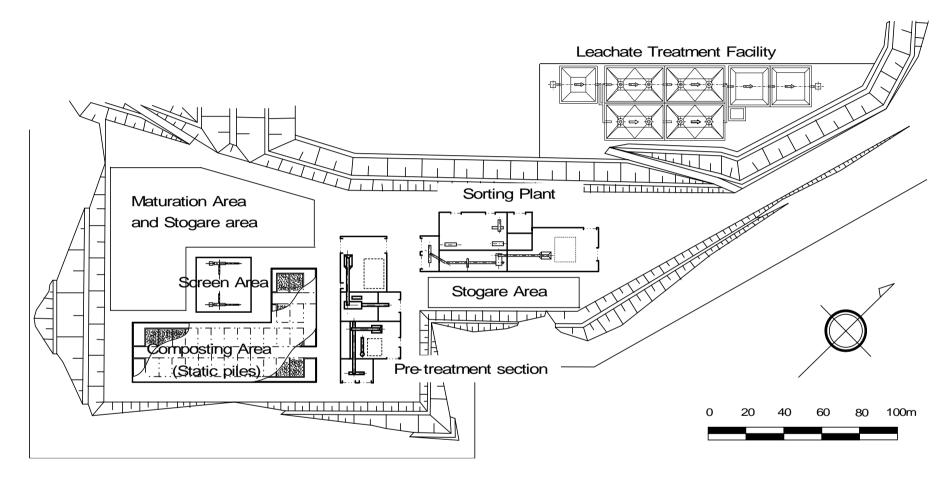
Layout of Proposed Compost Plant in Cimsa
